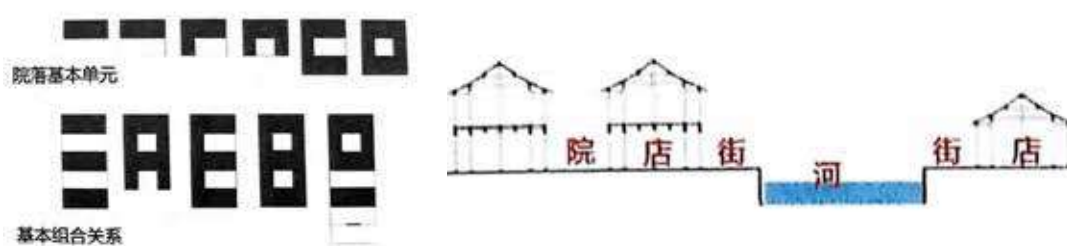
Zhangjiang Old Street courtyard and water street space pattern
